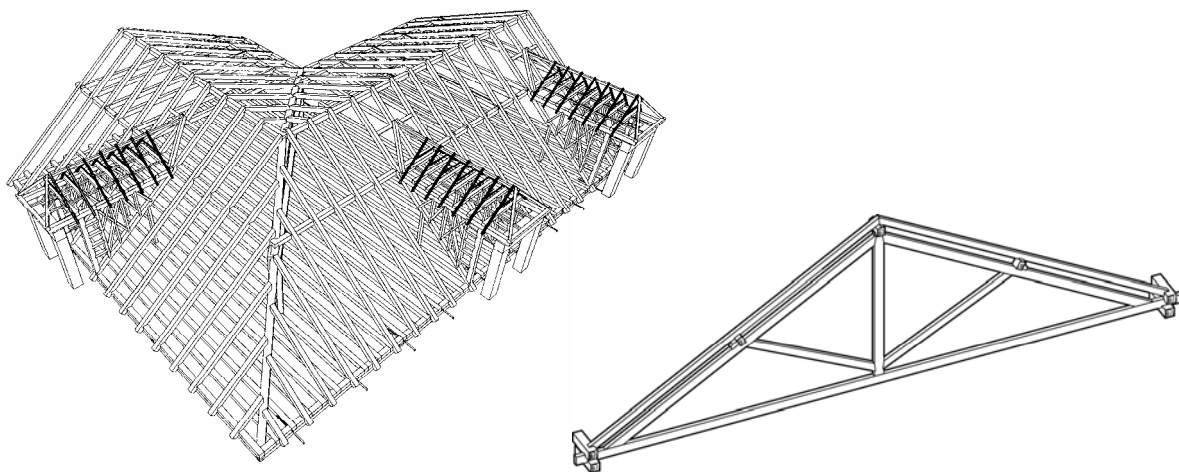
Details of the Pombaline construction: (a) roof structure, b) king post truss.
